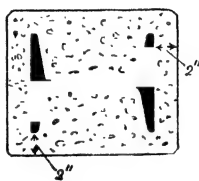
Protection of Pillars in the Internal Skeleton.
